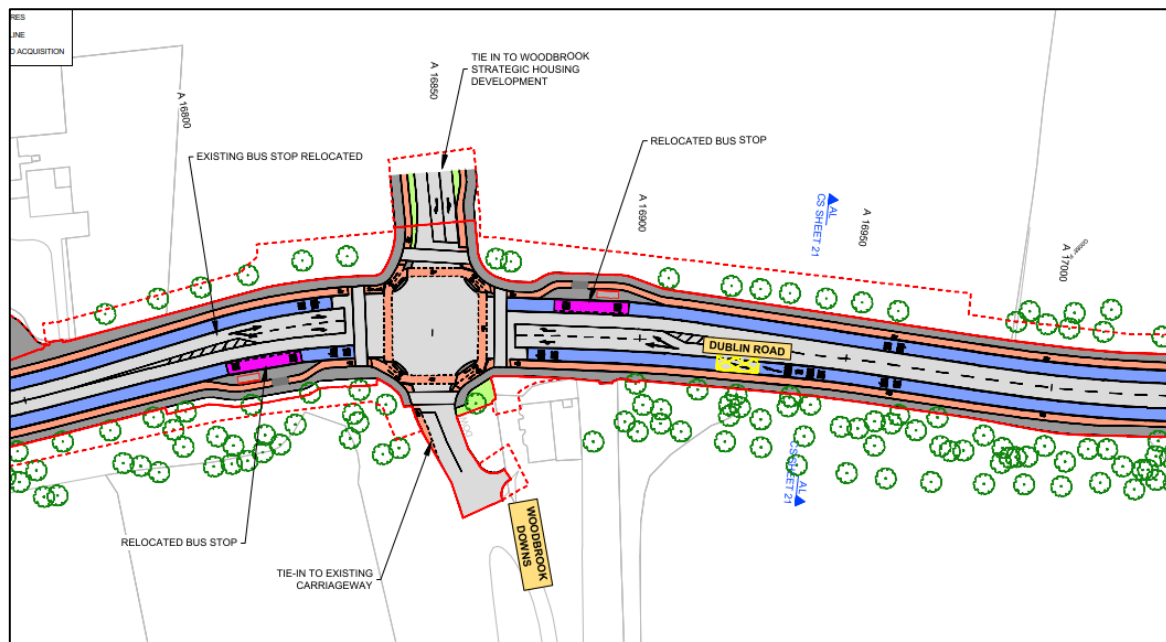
Extract from General Arrangement Drawings at Woodbrook SHD (Sheet 48)
